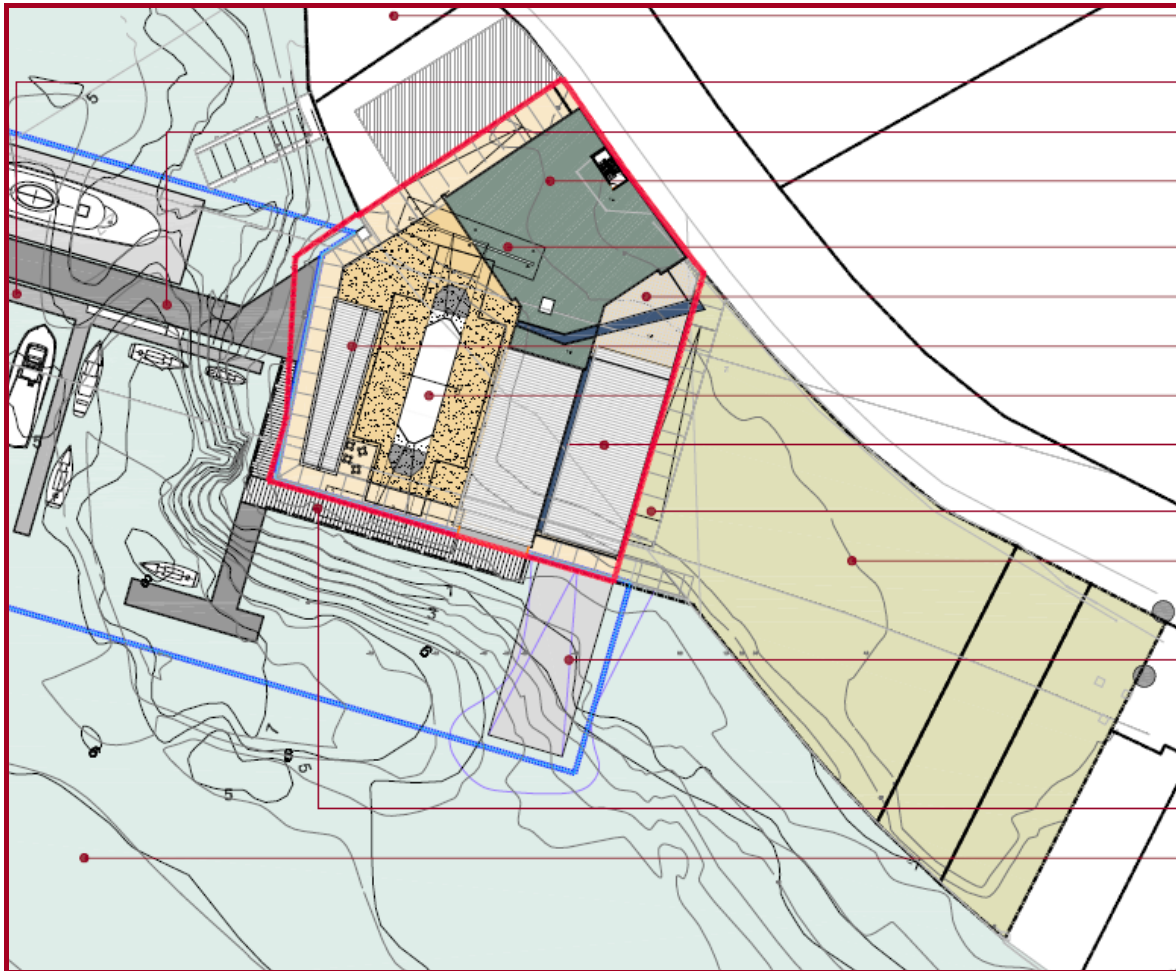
Location of area of proposed development showing the subject site (outlined in red). The proposed community park (in green) is excluded from this assessment. (Source: Drawing SK10, Preliminary Environmental Assessment).
